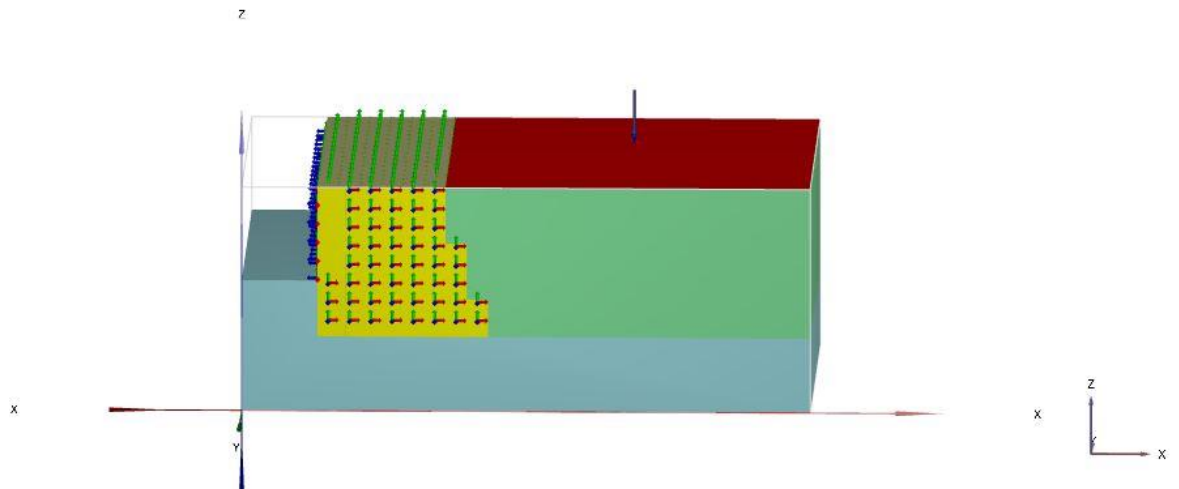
Geocell reinforced retaining wall model inclined with facing angle making 90° with horizontal with surface load generated in PLAXIS 3D
